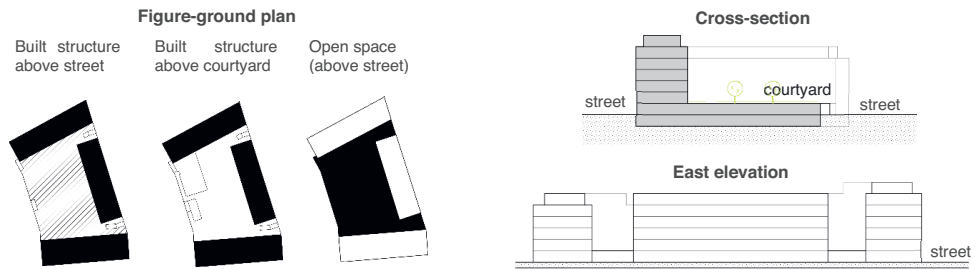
Example of podium type – plan drawings (within zoning plan limits) and sections showing built and outdoor spaces relative to the surrounding streets; case located in Lille Bislett 2–26
